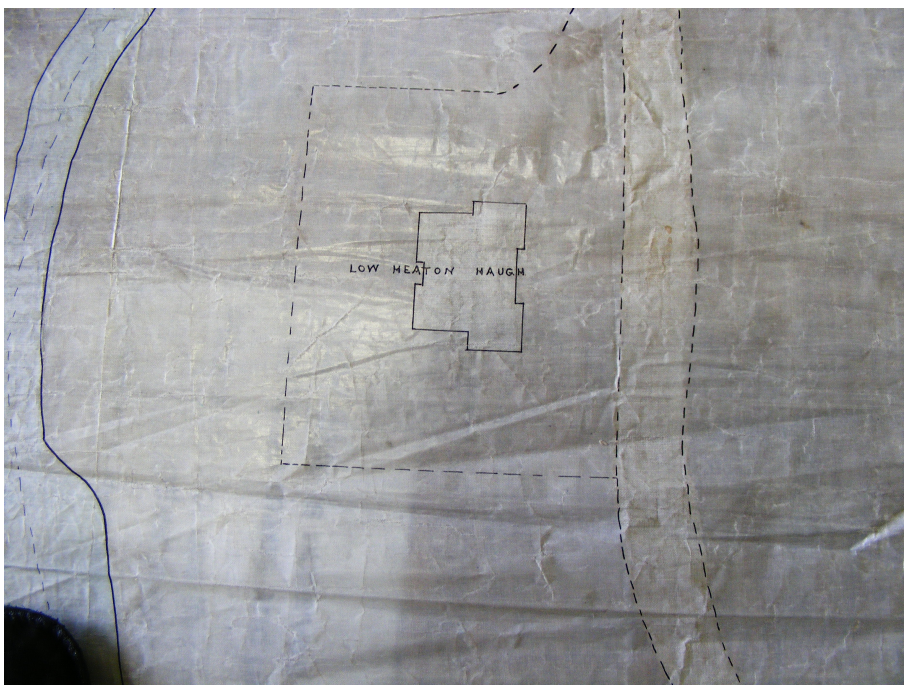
Low Heaton Haugh (or Low Heaton Farm) from T186-V145 building plan (from 1876 to 1879)
